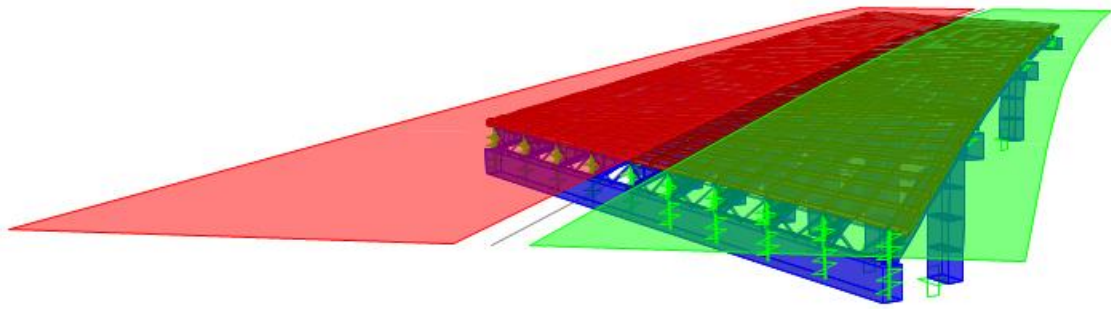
Completed 3D Model of Plattsmouth Bridge
